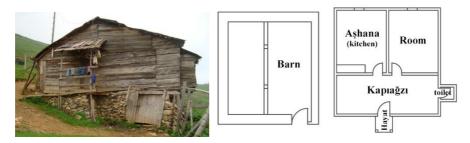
Çağmanlık Highland Dwellings (Durdu, 2011), ground floor and first floor plan (drawn by the author)
